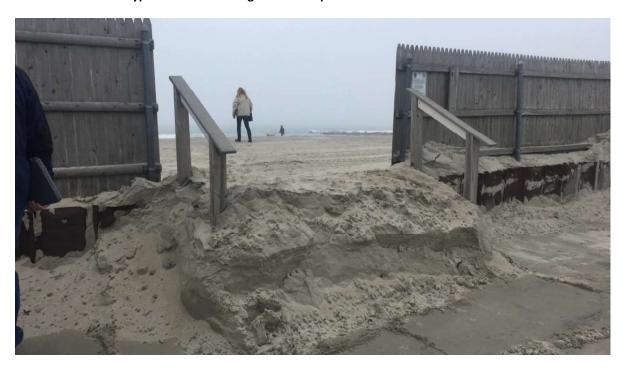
Example of sand drifts at stairs and along bulkhead impeding foot traffic.
